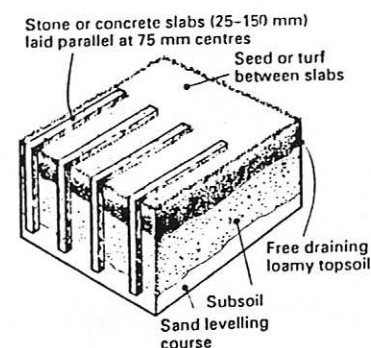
Stone slabs used to reinforce heavily used turfed entrances
